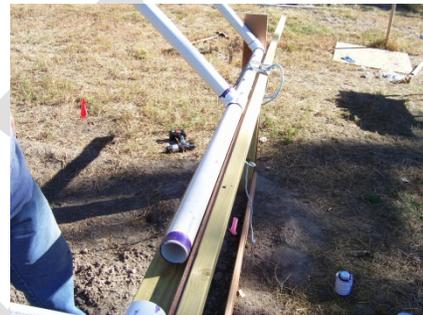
Attachment of Rib assembly to wooden base. Drilling hole for carriage bolt; note 3/8” lath spacer at joint and holding the rib in place with rope.
